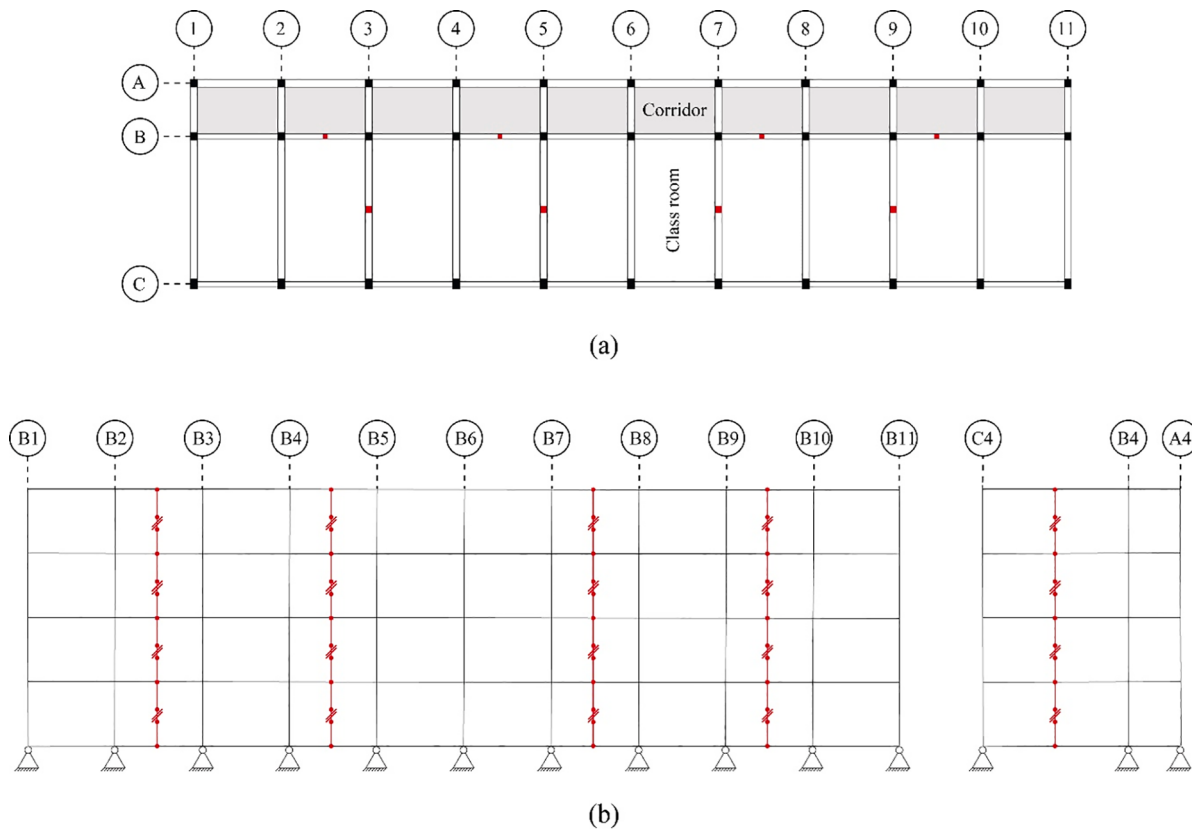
Location of VEDs: (a) Plan view; (b) Elevation view.
